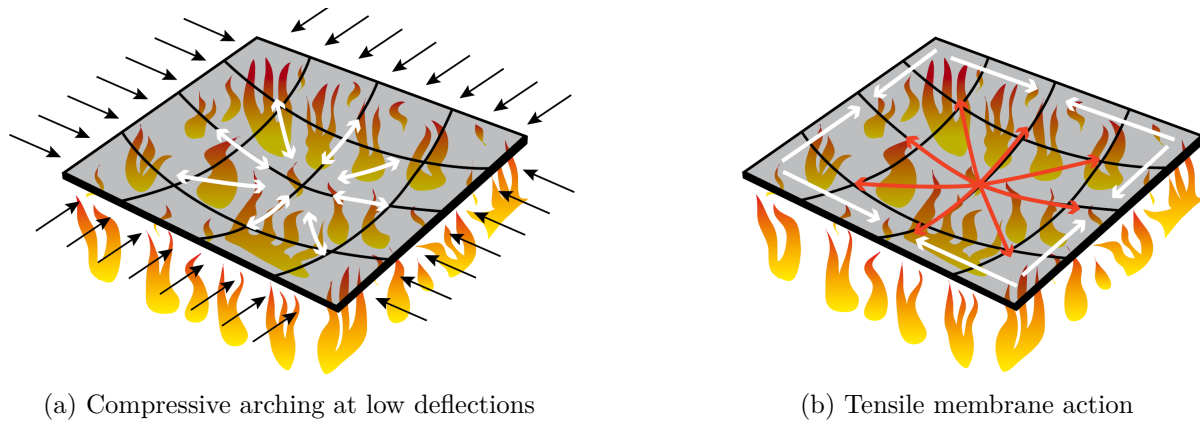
Development of tensile membrane action in a composite steel deck floor (Barrett Byrd Associates, 2013)
